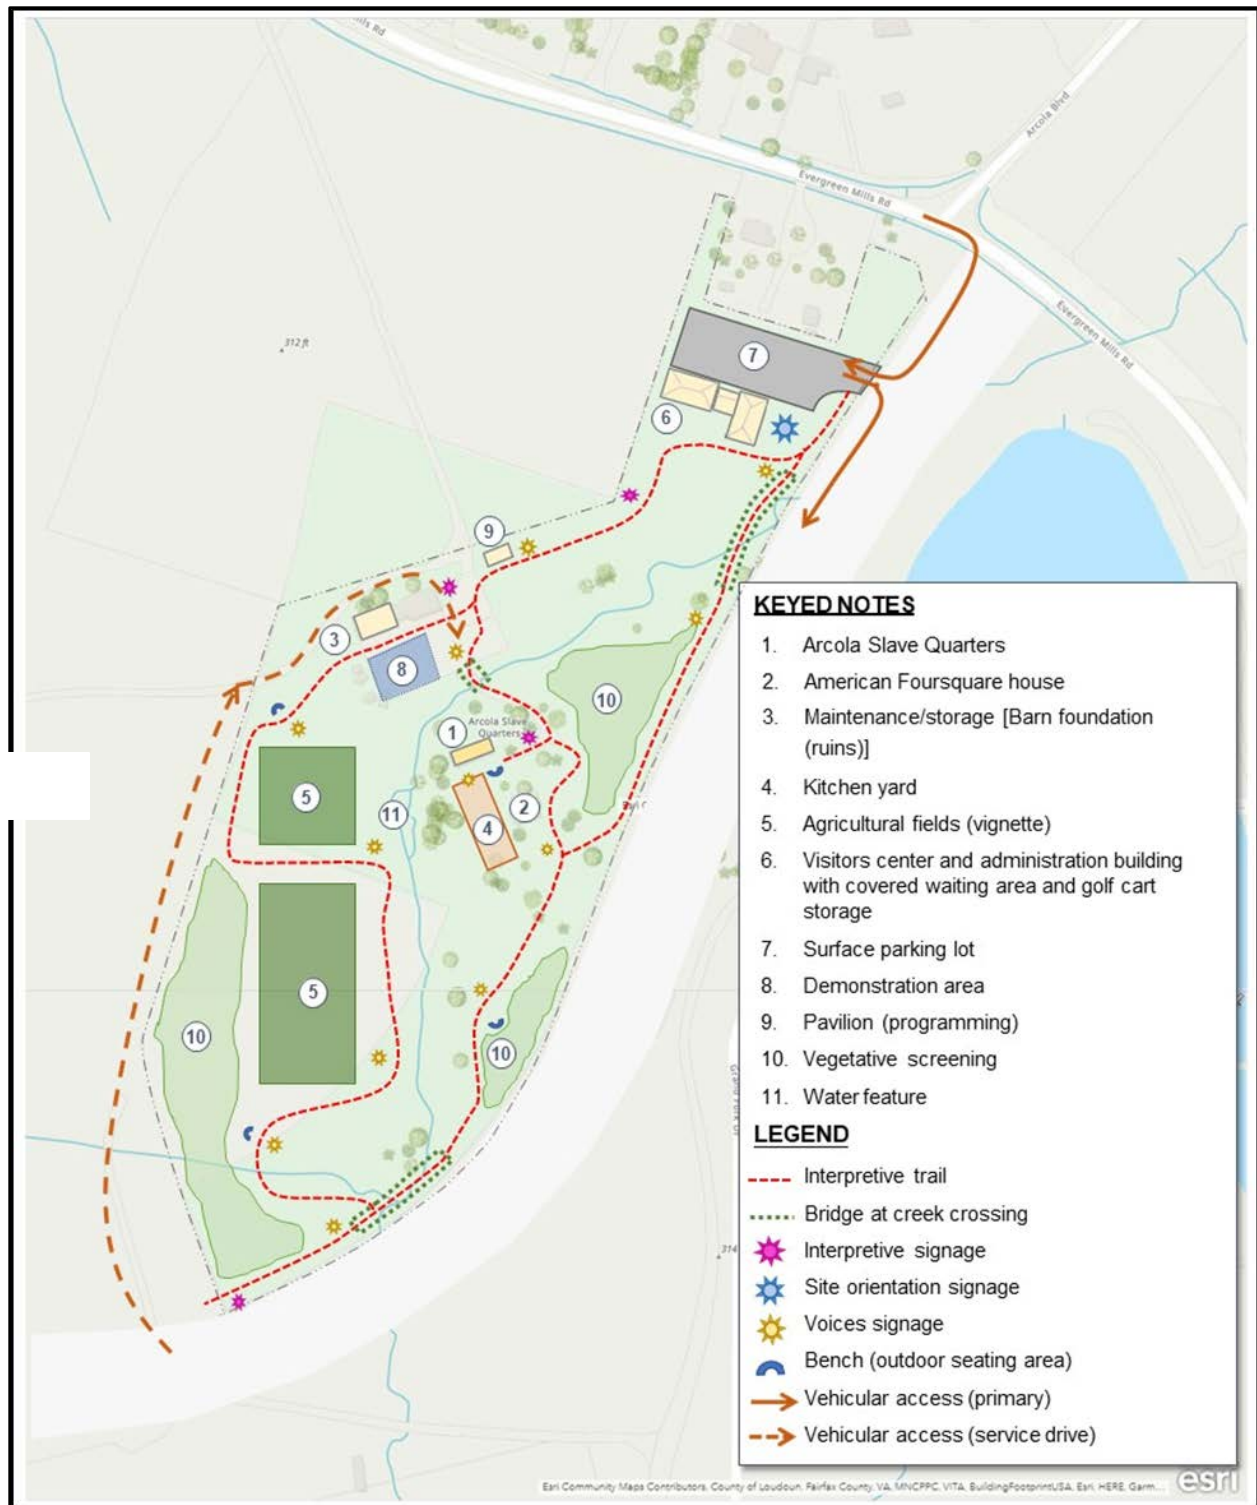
Proposed Site Plan and Circulation Diagram for AQE Site
